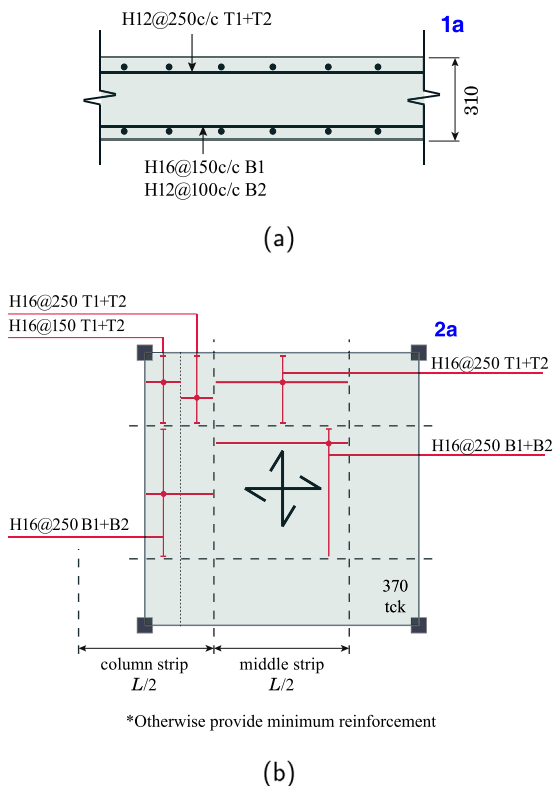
Single bay slab: flat slab design, (a) simply supported case (depth: 310 mm); (b) corner supported case (depth: 370 mm). All dimensions in mm.
